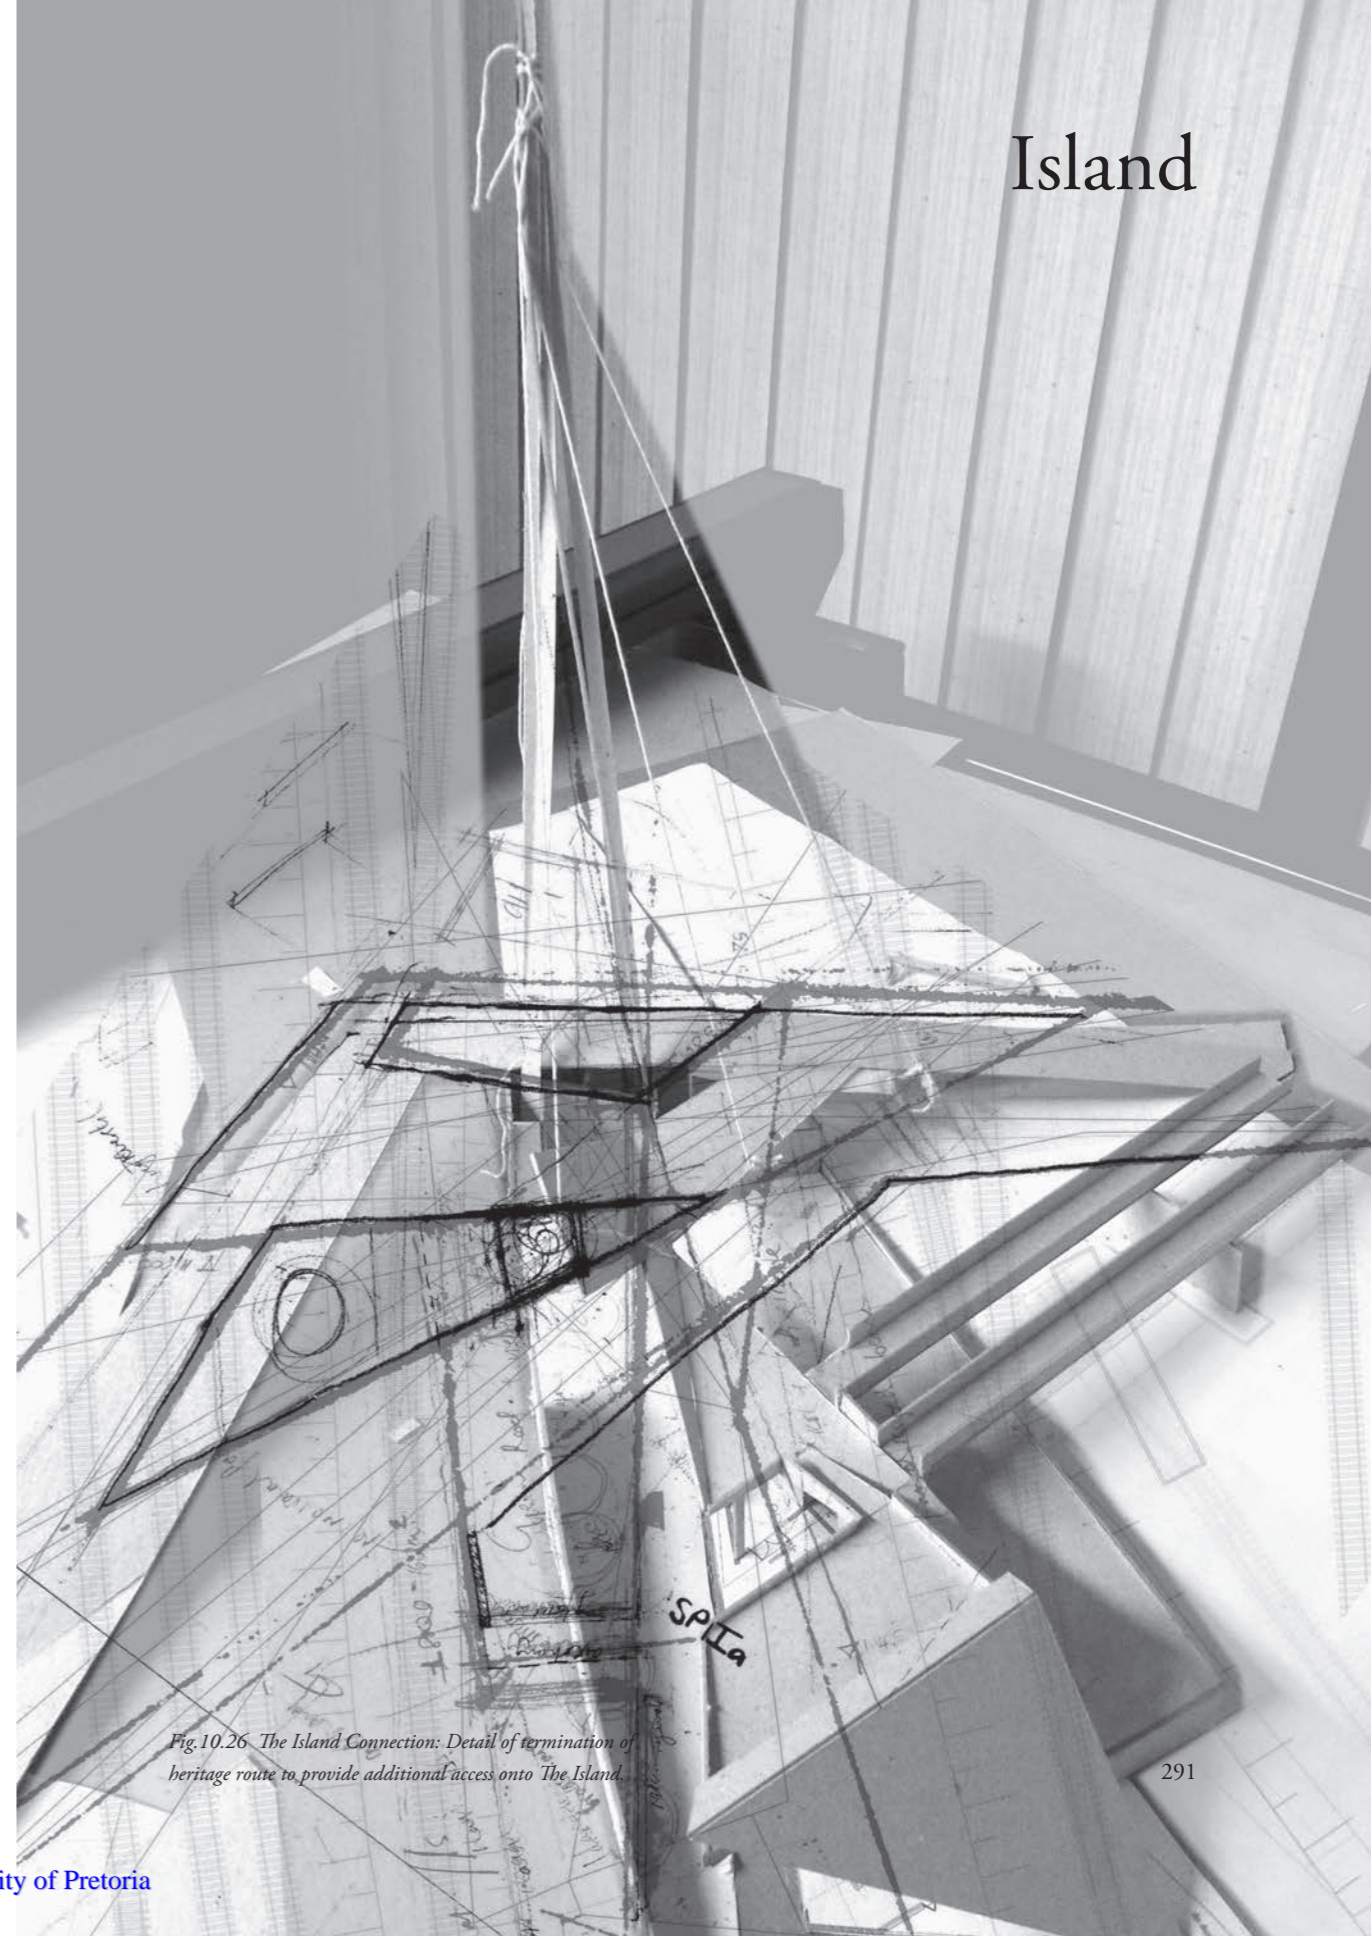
The Island Connection: Detail of termination of heritage route to provide additional access onto The Island.
